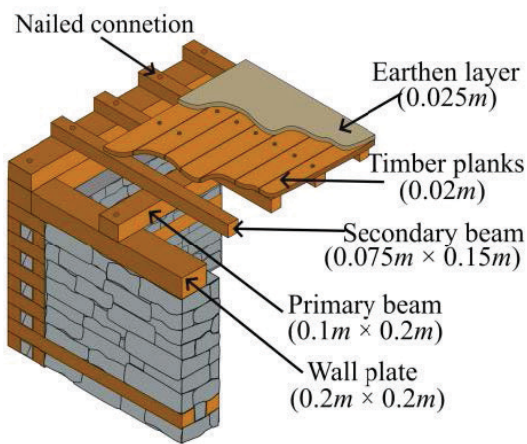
Typical sketch of the floor system in Thathara buildings
